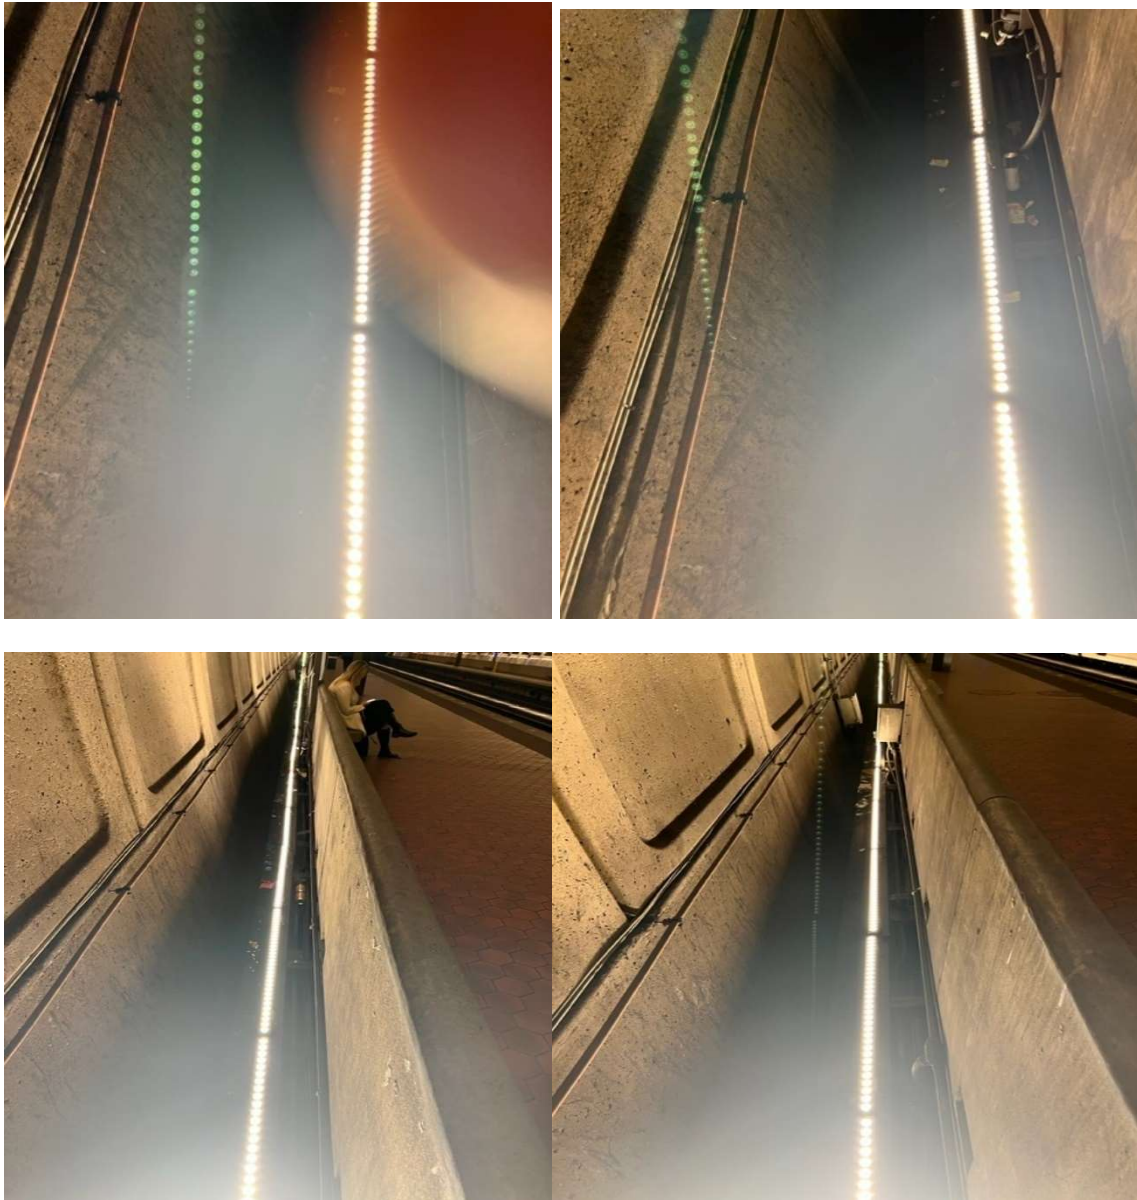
Photos of trash behind Parapet Wall Track 1 side
